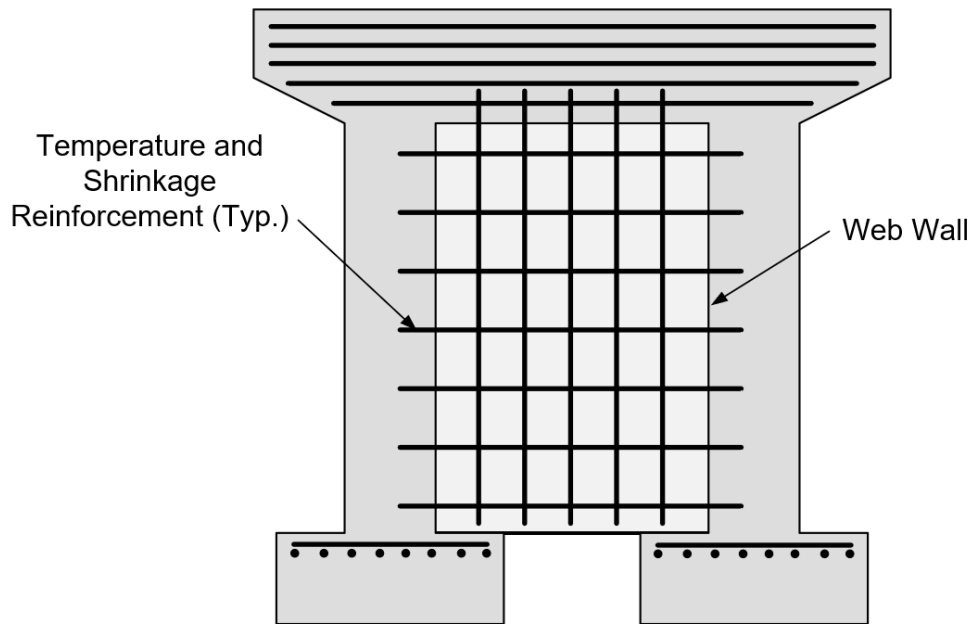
Secondary Reinforcement in Column Bent with Web Wall
